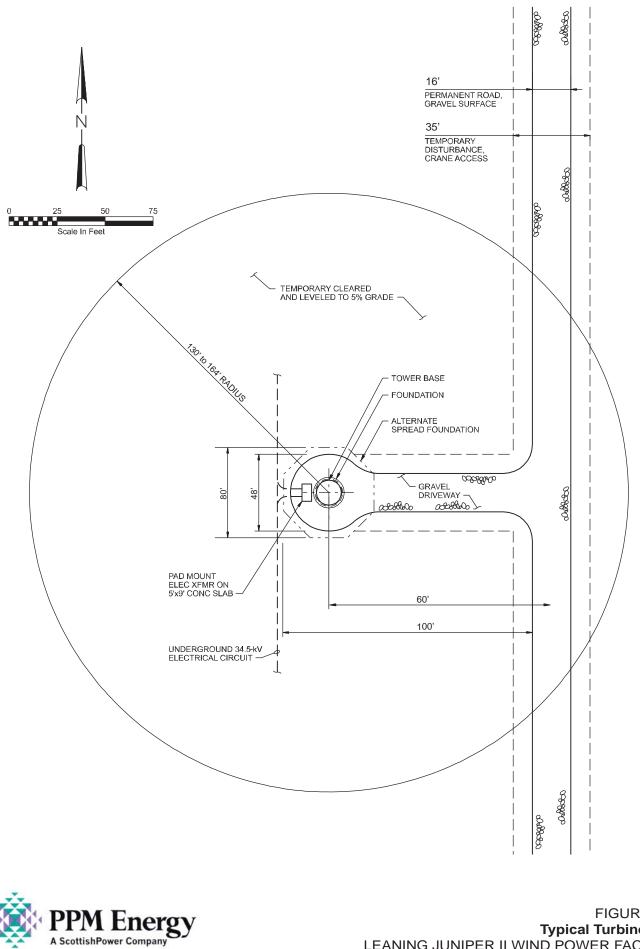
Typical Turbine Site LEANING JUNIPER II WIND POWER FACILITY
